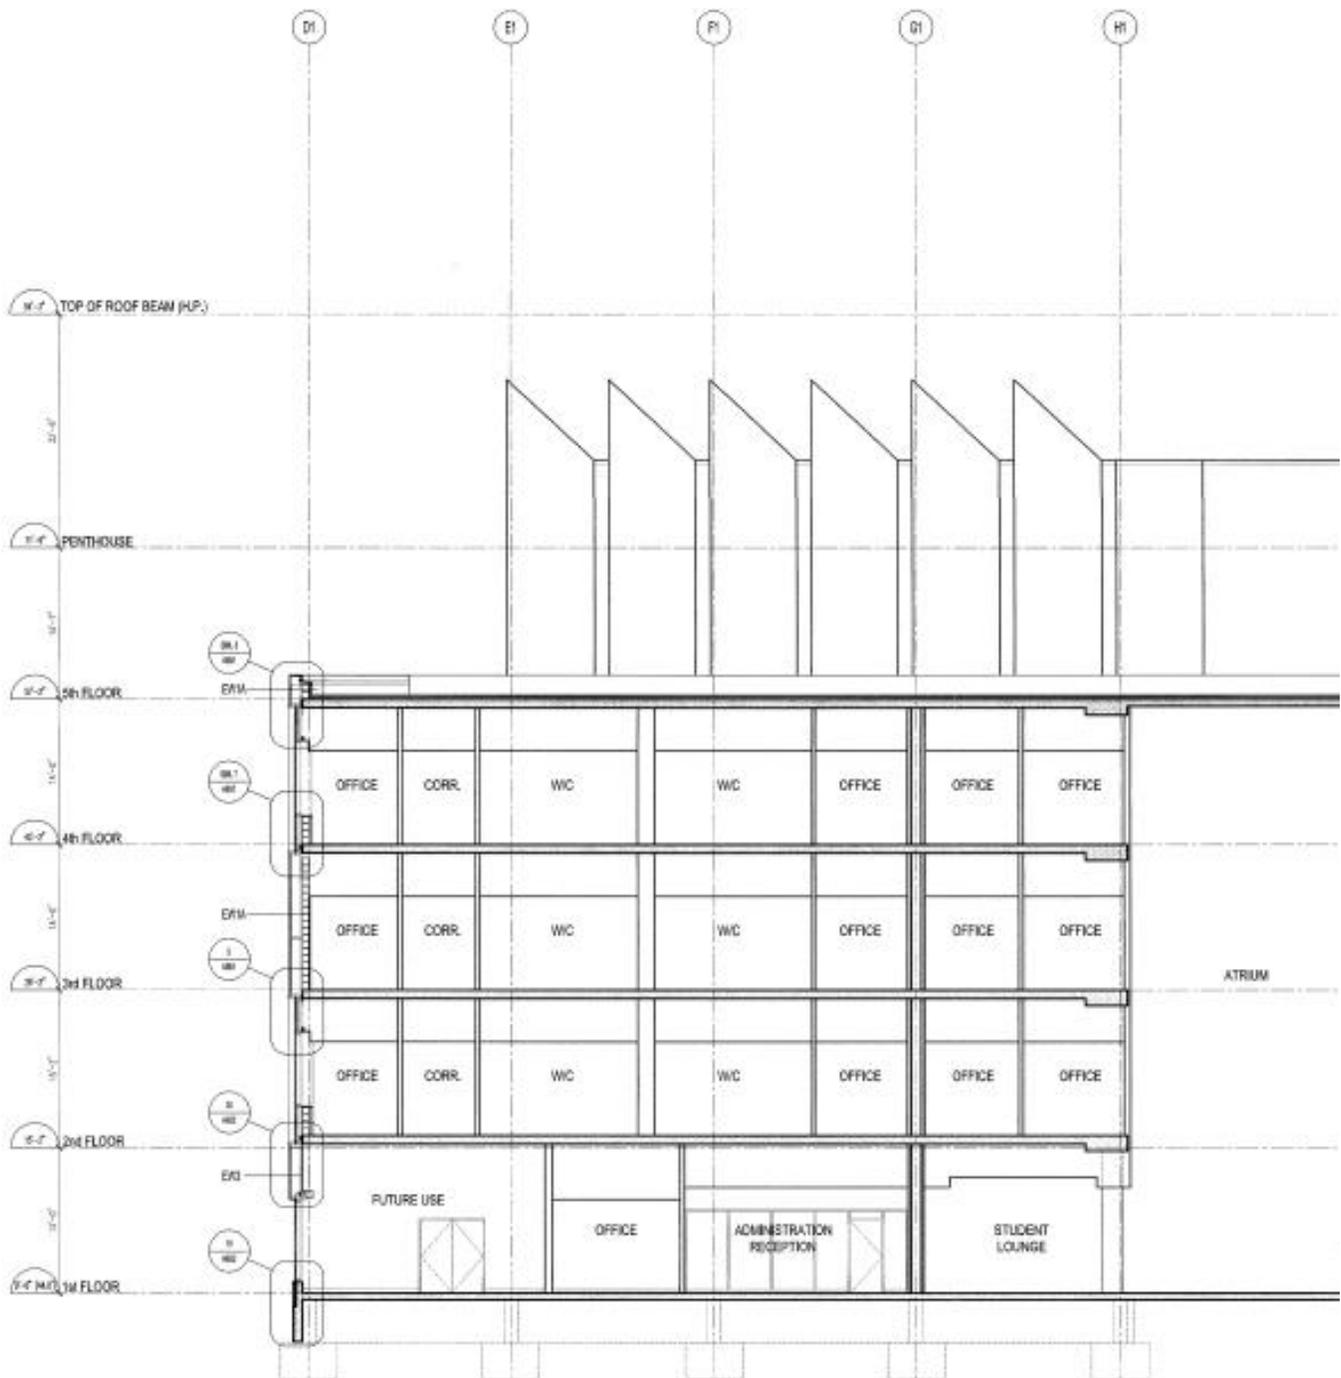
Section 4 through portion of building at -20° rotation (see Figure 1), taken from 3/A403.
